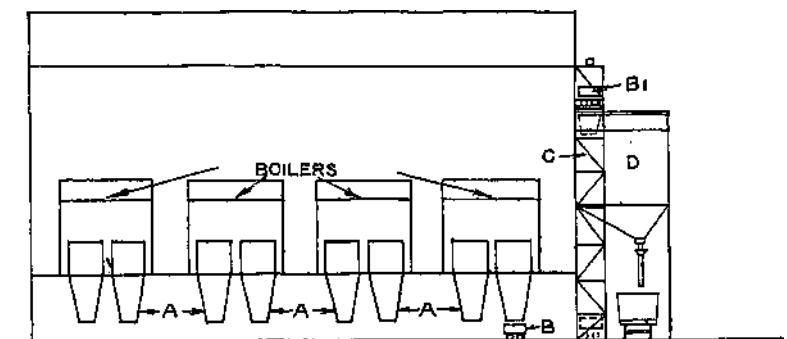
A.—Typical Arrangement of Ash Handling Plant with Ash Wagons and Ash Wagon Hoist
